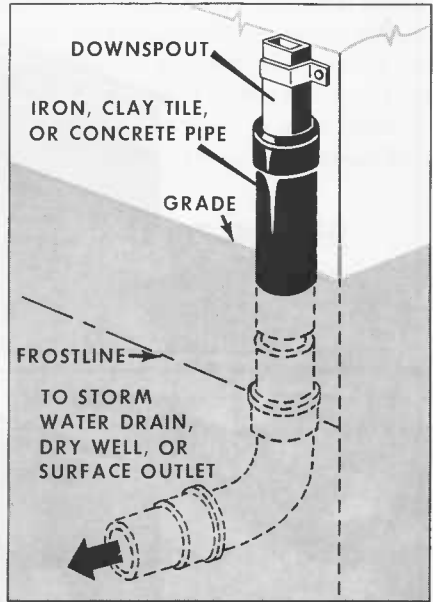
Roof water can be routed to a storm water drain or other outlet.
